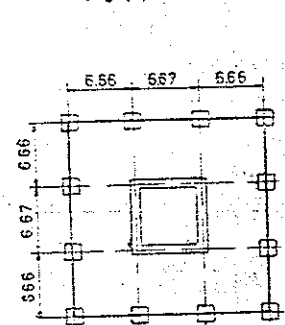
Plan of 20-Story Shear Wall-Frame Building
